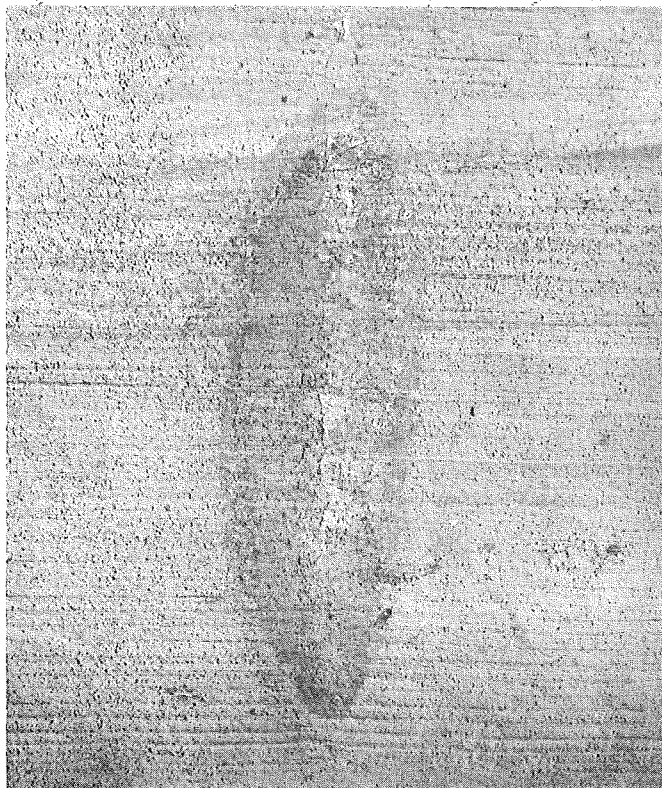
(left). Light crack developing at the bottom of a ripple, over reinforcing steel.
